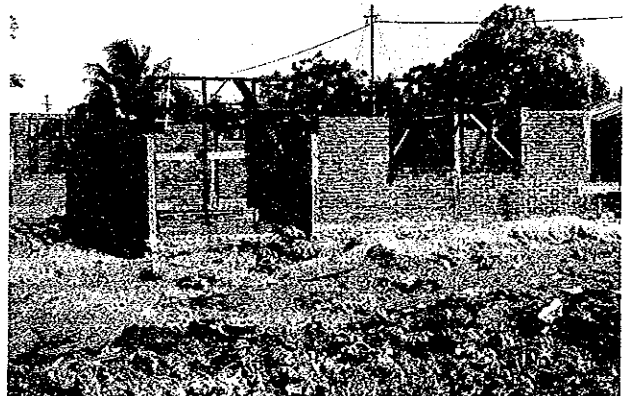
New Type Masonry Wall Building with Reinforced Concrete Framing; Under Construction
